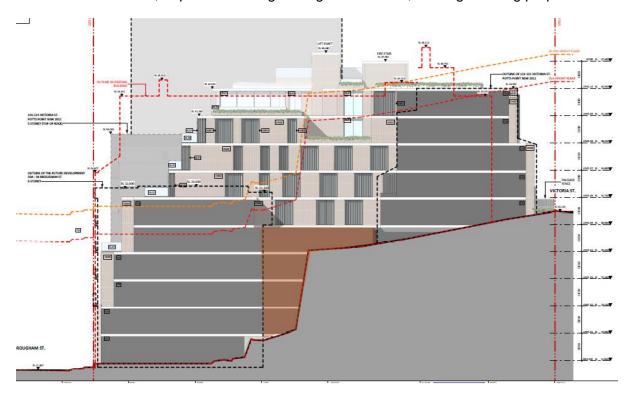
Excerpt of proposed southern elevation which shows built to boundary sections of the proposed basement levels (highlighted in orange)
